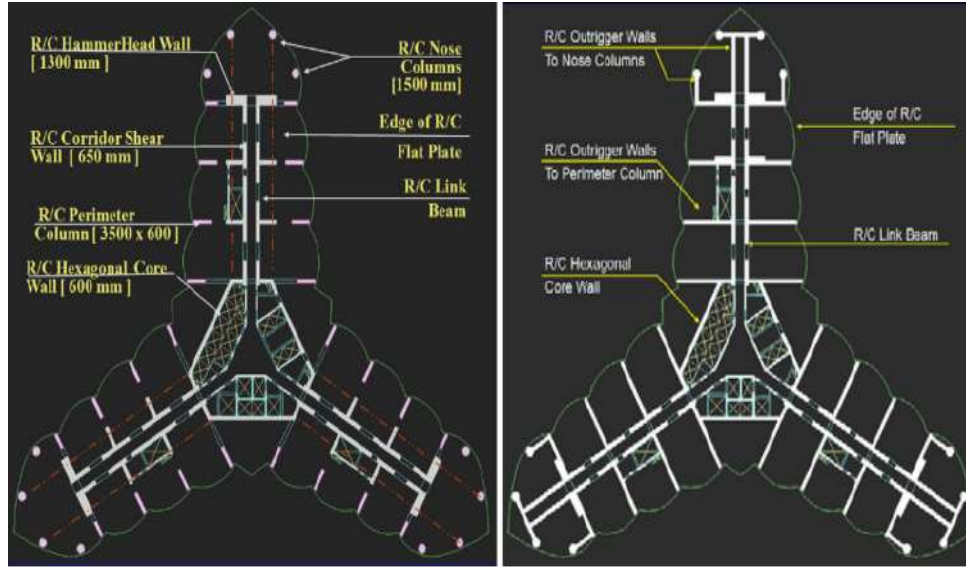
Typical Floor Framing Plans at a) typical hotel level and at b) Typical Mechanical Level[30]
